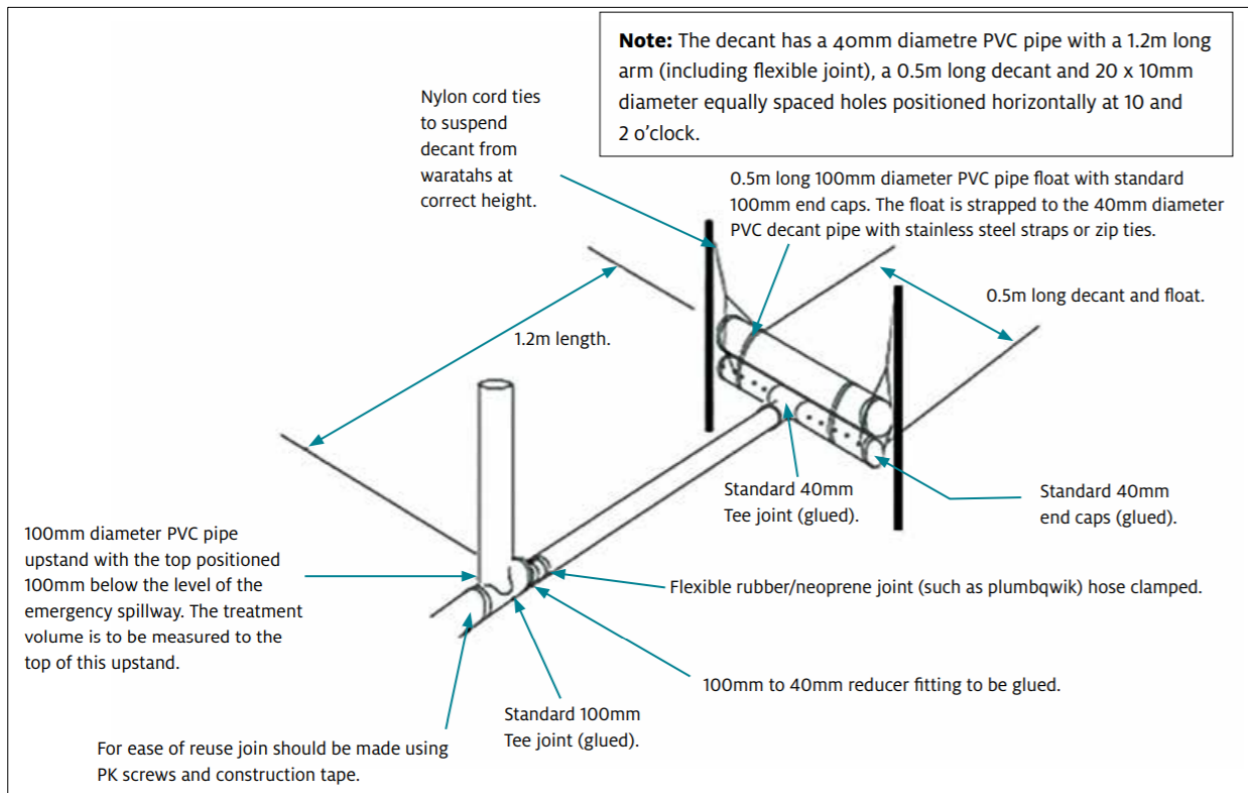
Cross-section of a T-bar used in a decanting earth bund.
